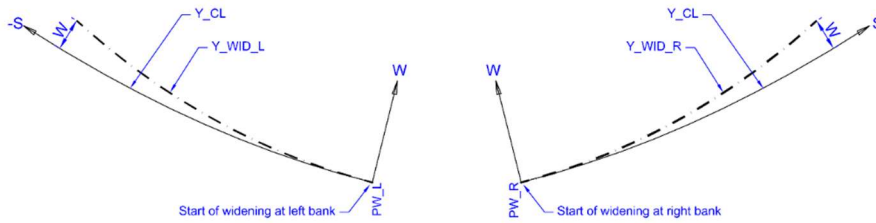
Arch dam widening factor FW_L and FW_R for parabolic arch dam shapes
